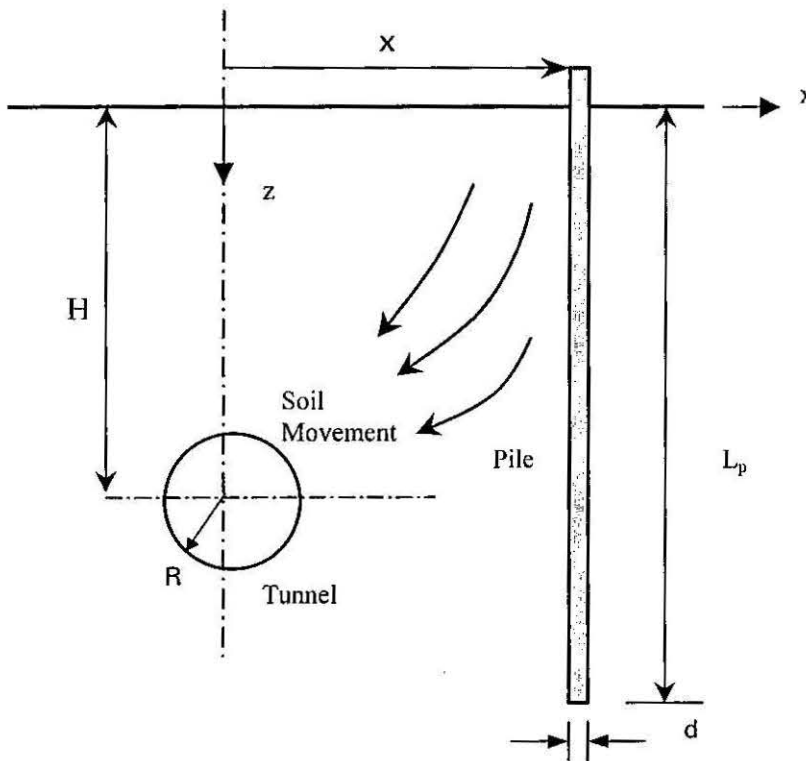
Single Pile Adjacent to Tunnelling - The Basic problem Analysed
